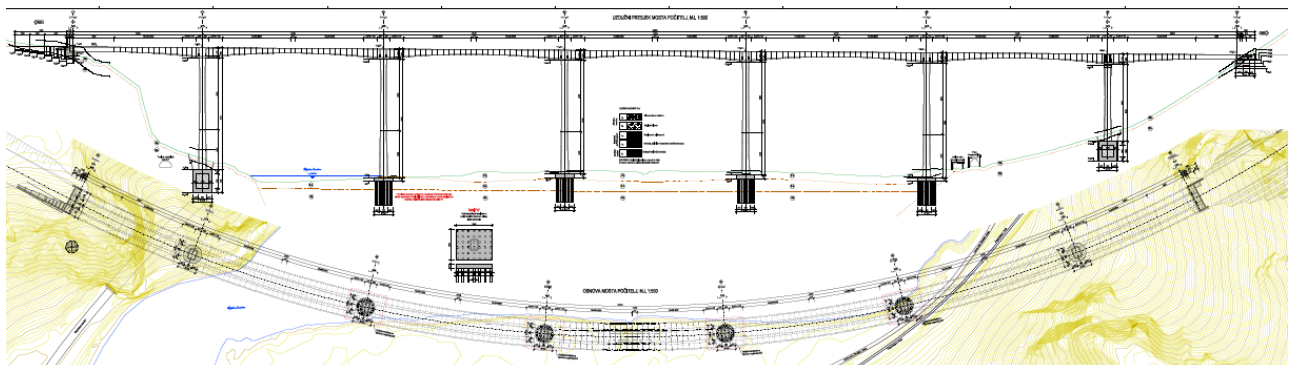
The constructive disposition of the high-way bridge “Počitelj-Zvirovici”
